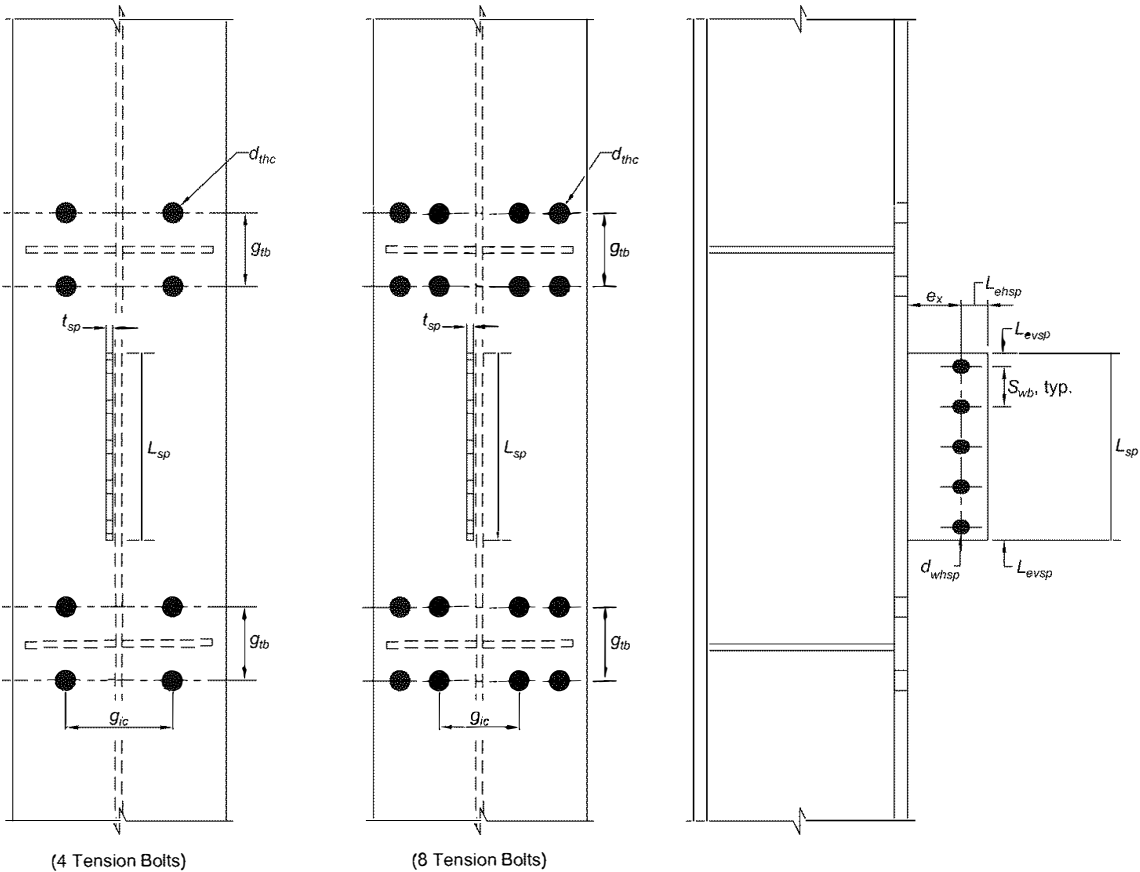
Column and shear plate dimensions for double-tee connections.
